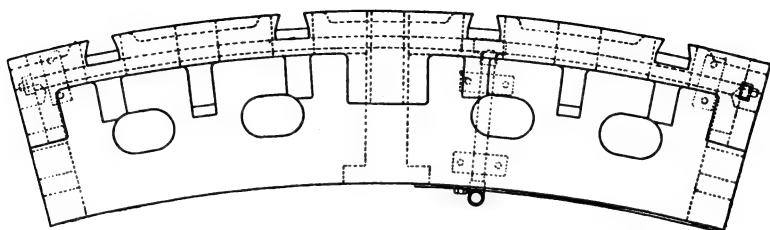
Plan of Segment of Floating Ring in Walker's Piling and Sand Tubbing Method, showing Water Piping.
